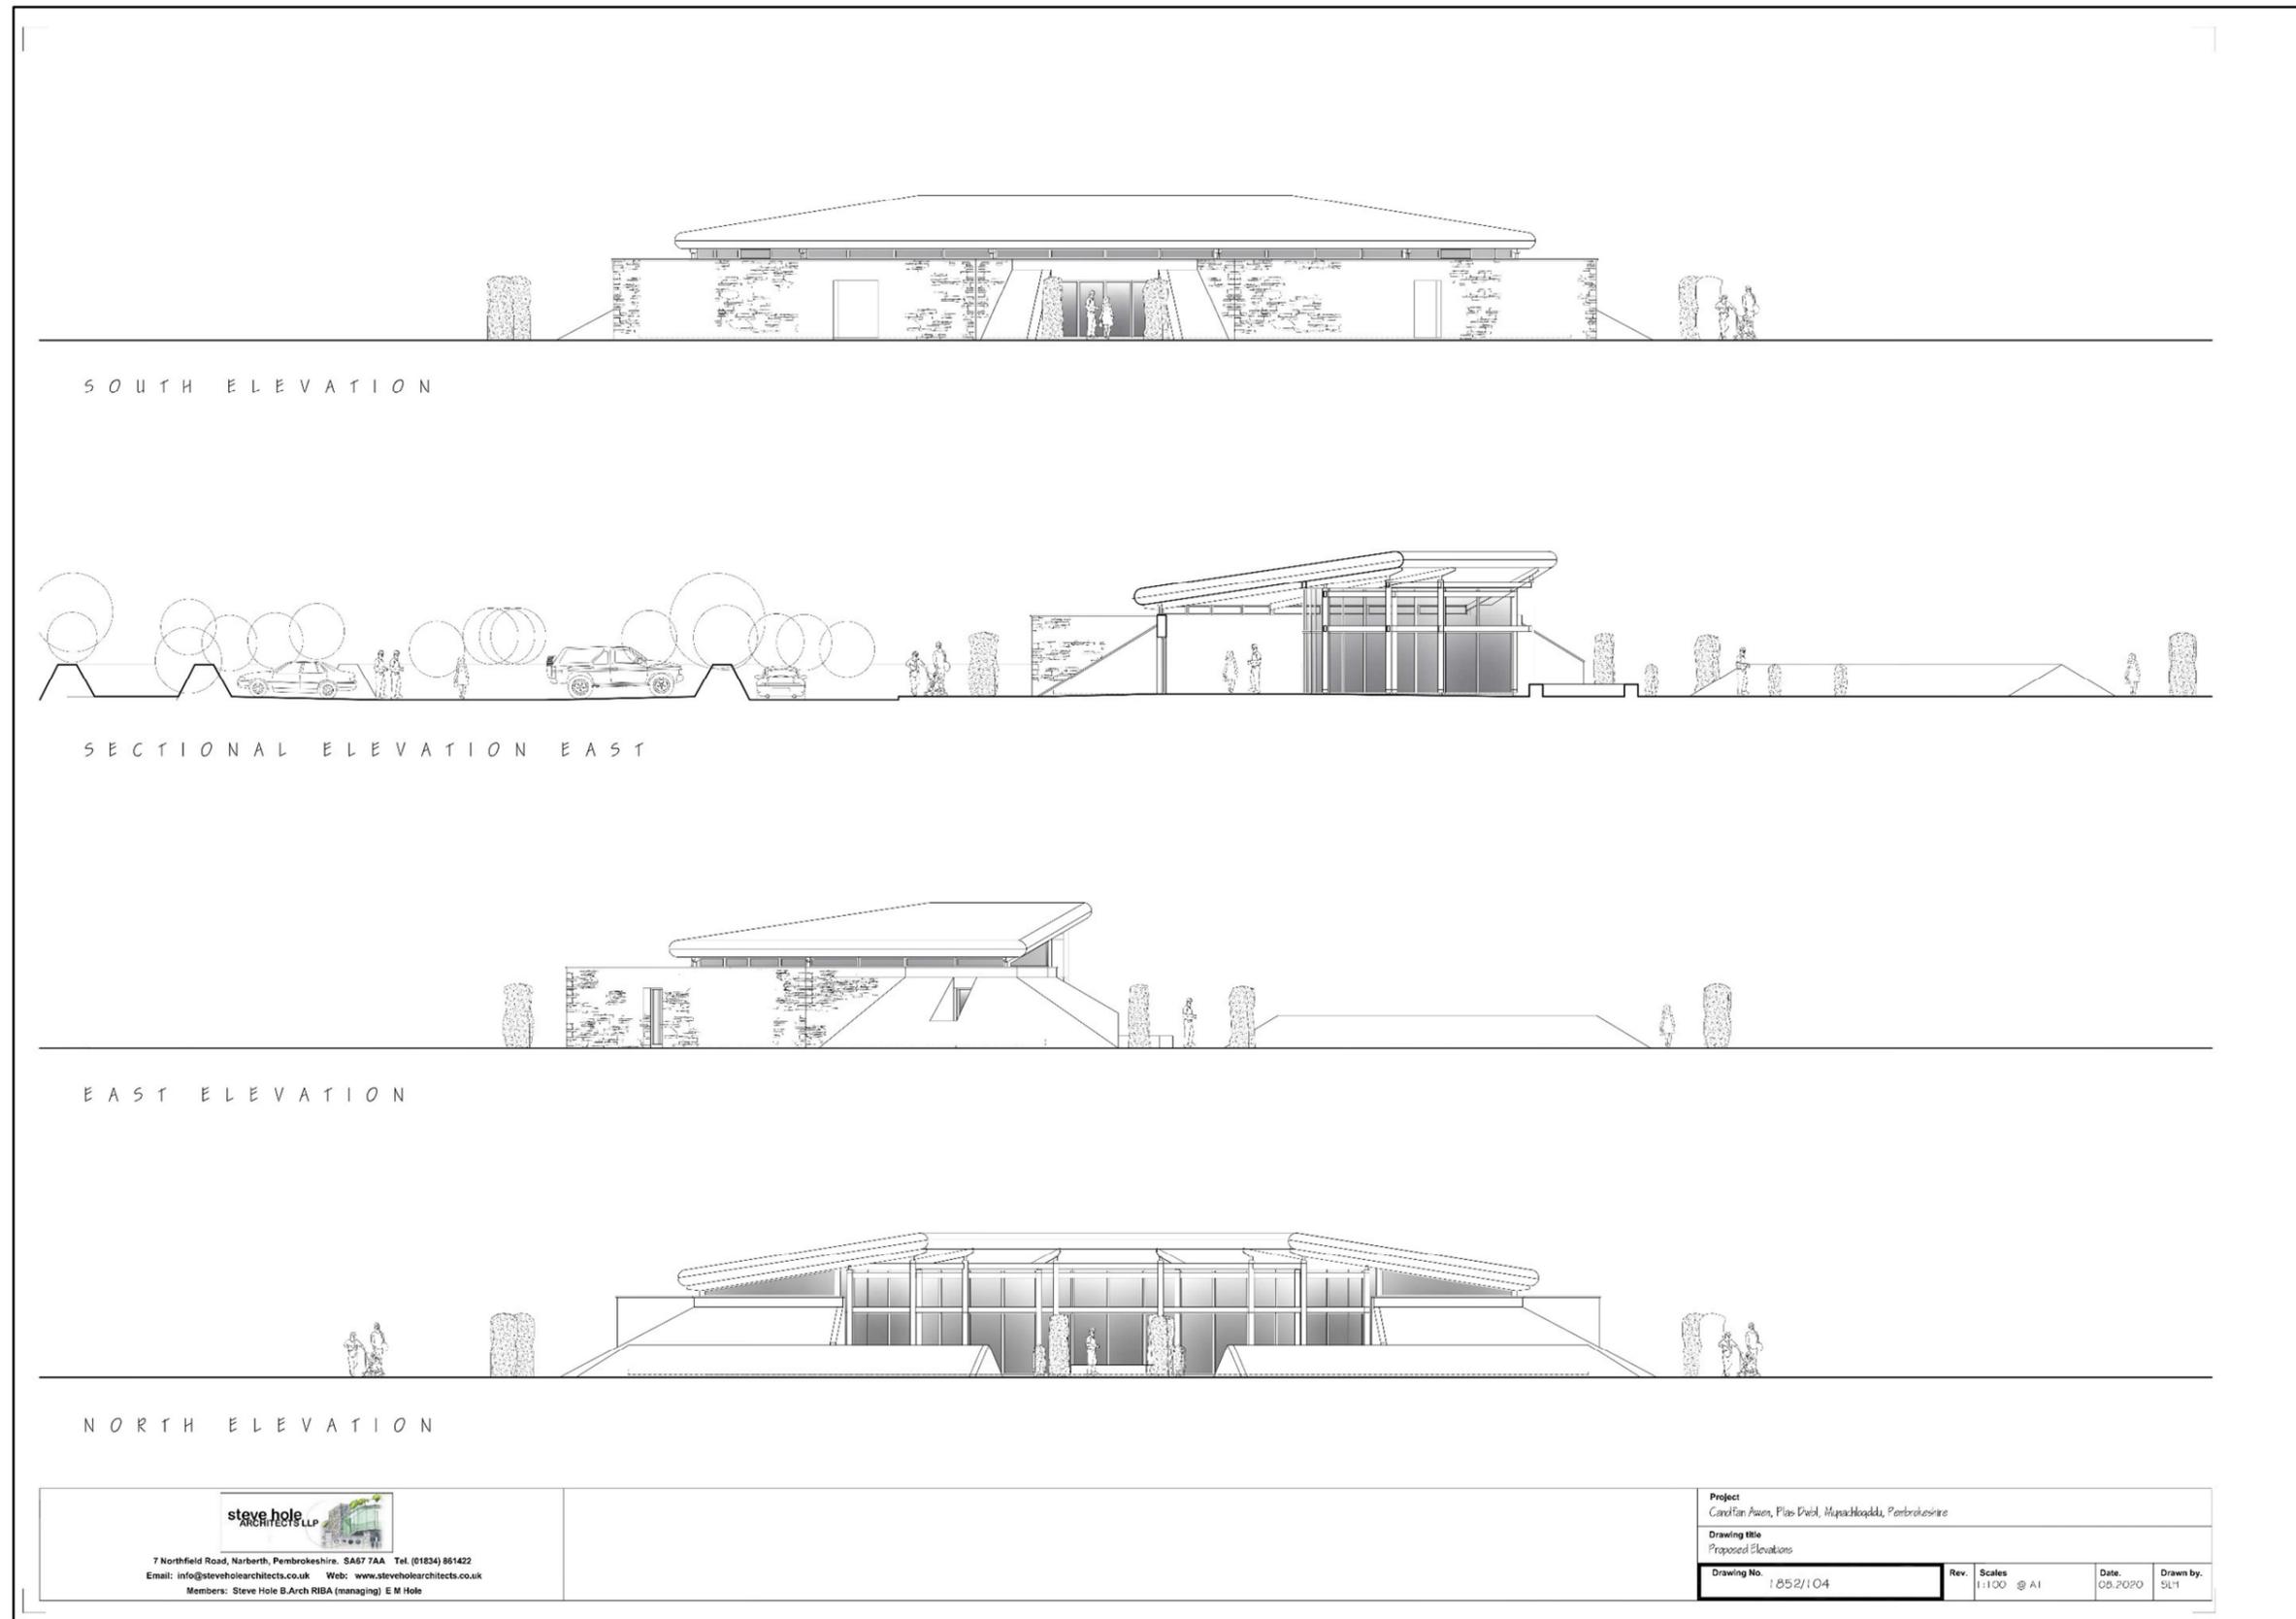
Proposed elevation drawings of Canolfan Awen (provided by Steve Hole Architects)
